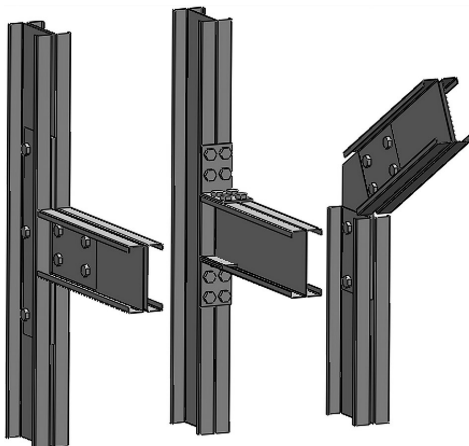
Beam-to-column bolted connections. From the left: 90 degree connection using gusset plate and angles, 45 degree eave connection with gusset plate
